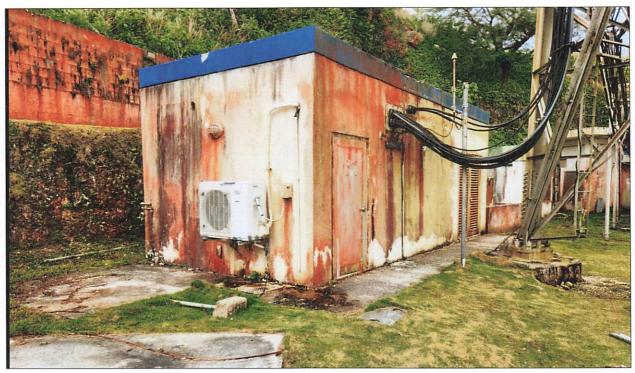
View west of east corner of Building 3 with western leg of tower on right side of photo (photo: D. Perzinski, 6/15/23).
